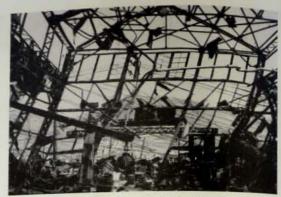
2,800 feet from GZ. Group 26, Building 10A. Interior, looking east.
